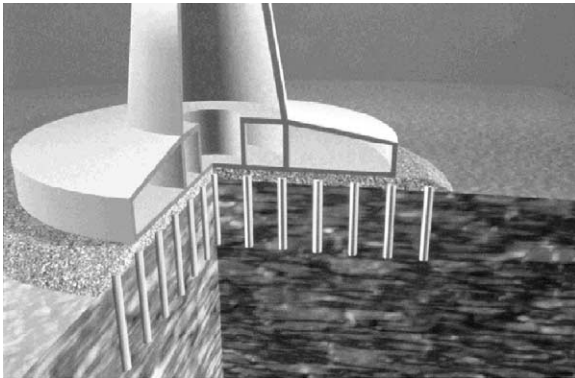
Foundation cross-section of a bridge pier, showing gravel layer, natural clay, and steel pipe inclusions placed to reinforce the clay.
